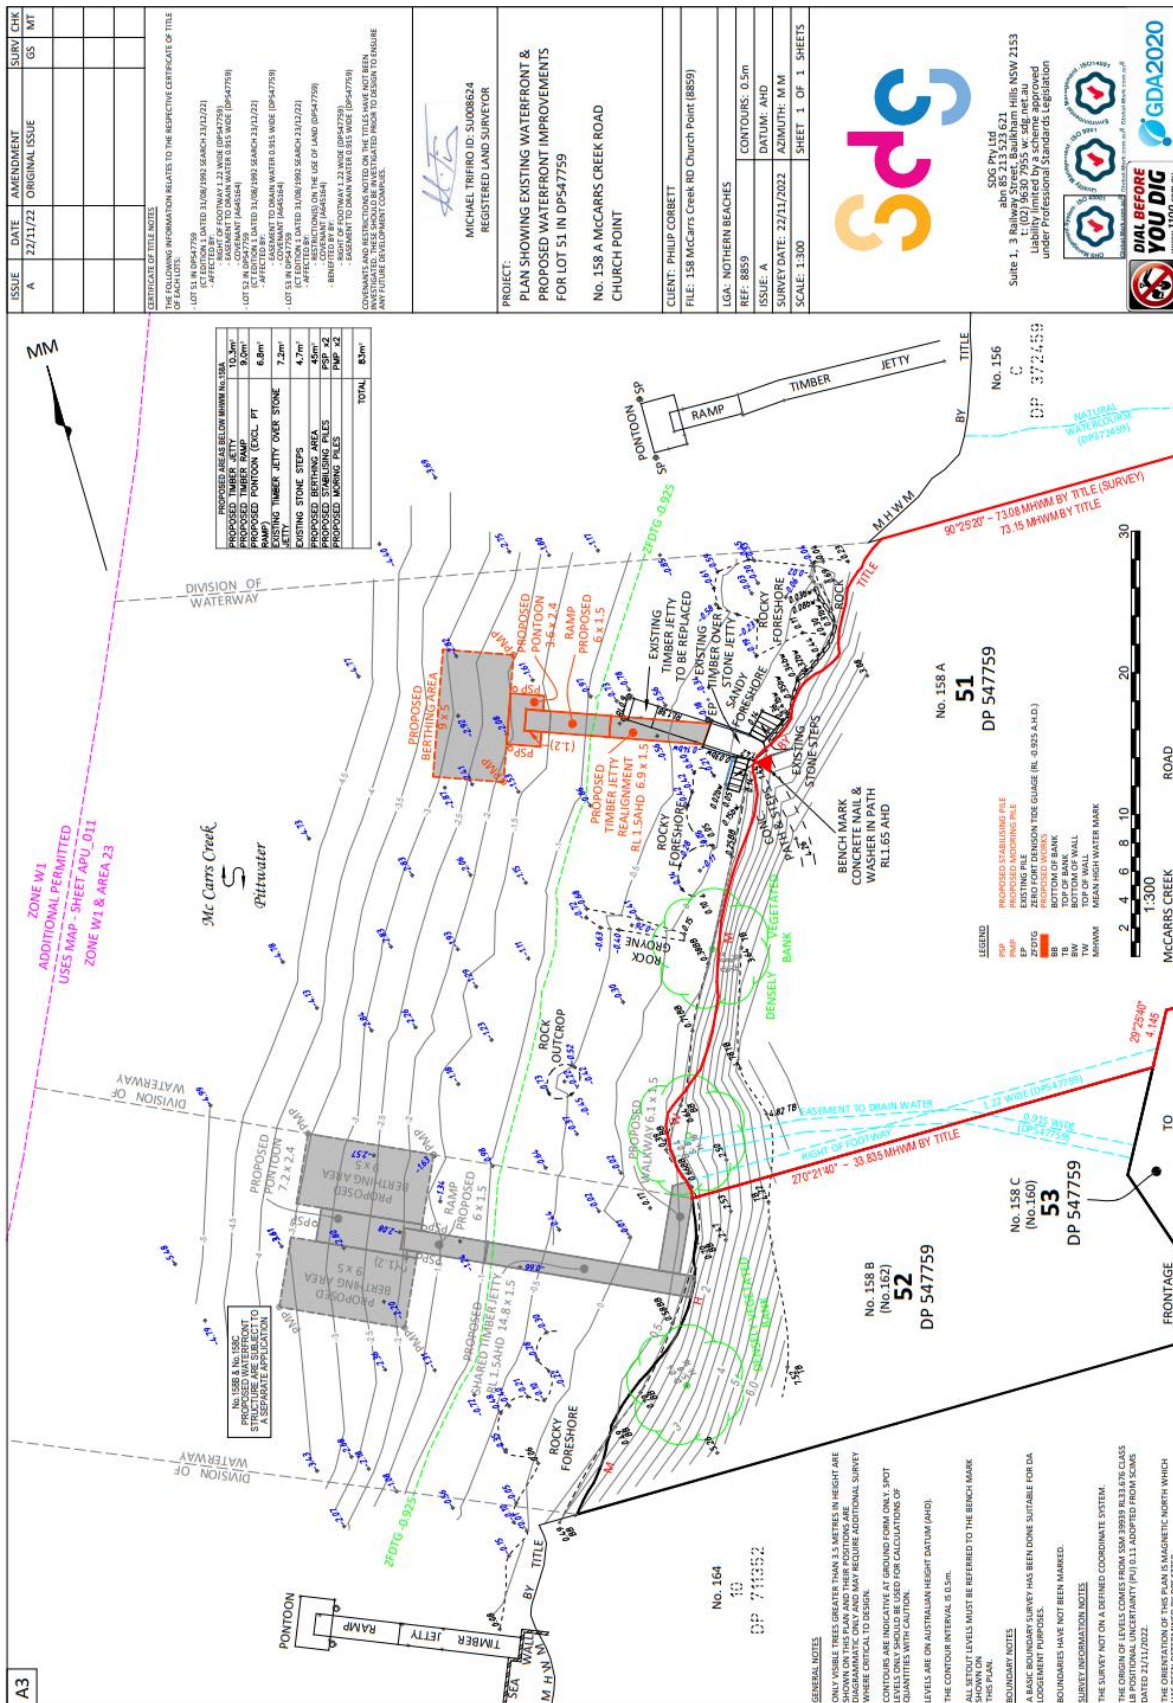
Plans of the proposed waterfront structures at the Subject Site.
